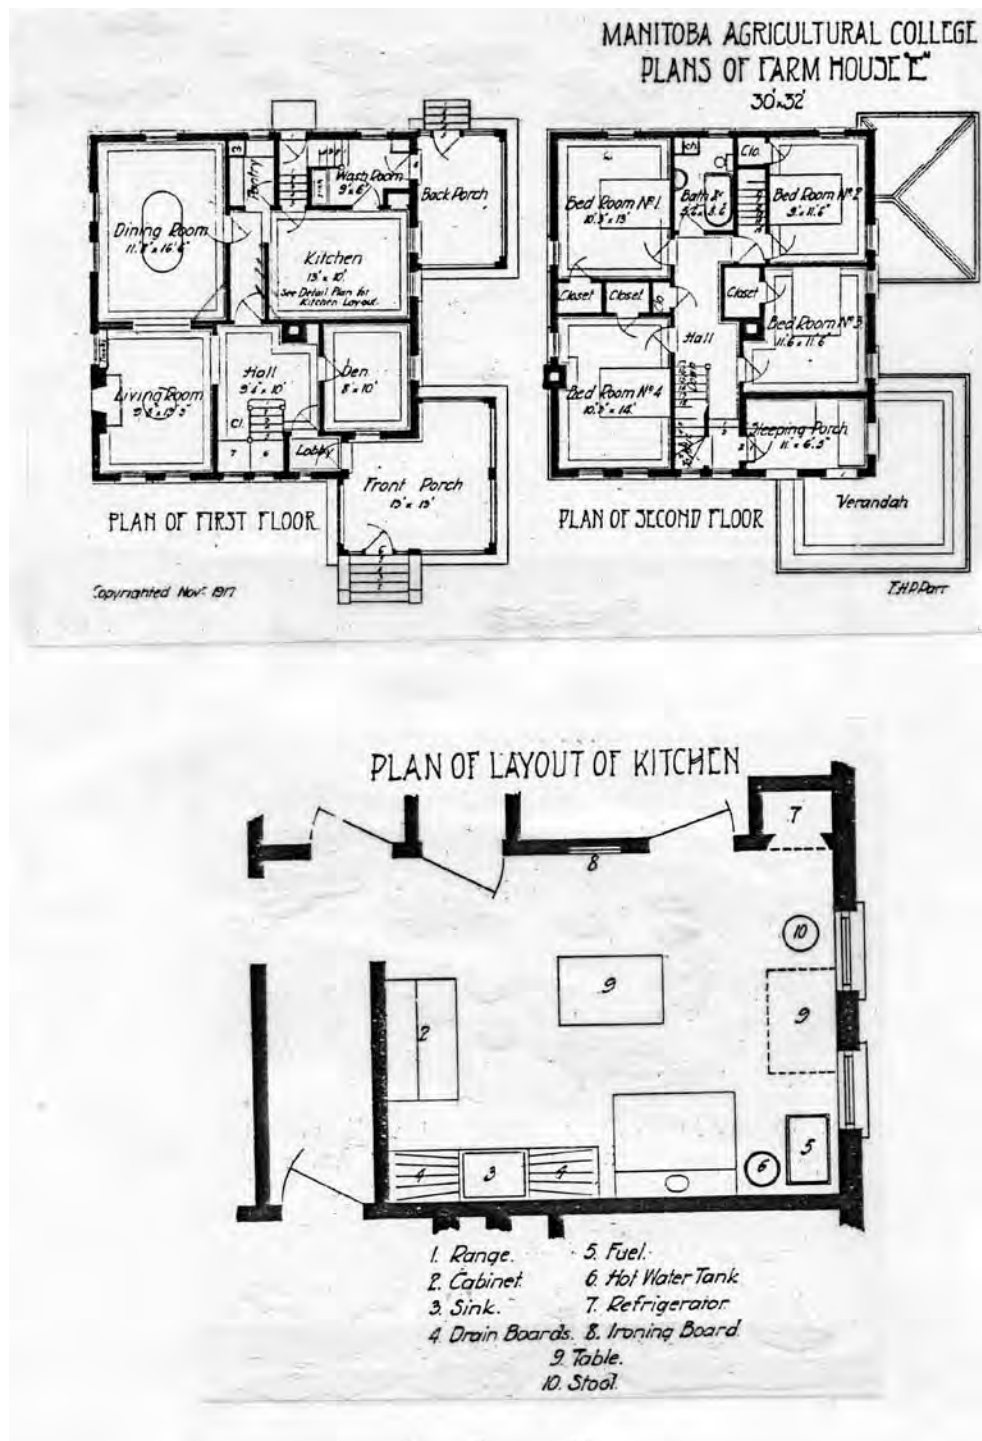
Floor Plan of Farm House 'E', as worked up by Francis H. Parr, from a layout submitted by Christina Guild, Kemnay, Manitoba. This plan was very similar to the Guild House as it was built. (L.J. Smith, Better Farm Homes, a Bulletin of House Plans. (Winnipeg: Manitoba Farmers' Library, Extension Bulletin No. 21, December 17, p. 16)
